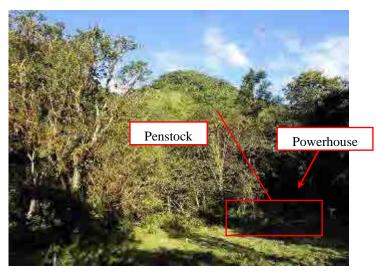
Condition of alternative penstock and powerhouse (View from surrounding powerhouse)
